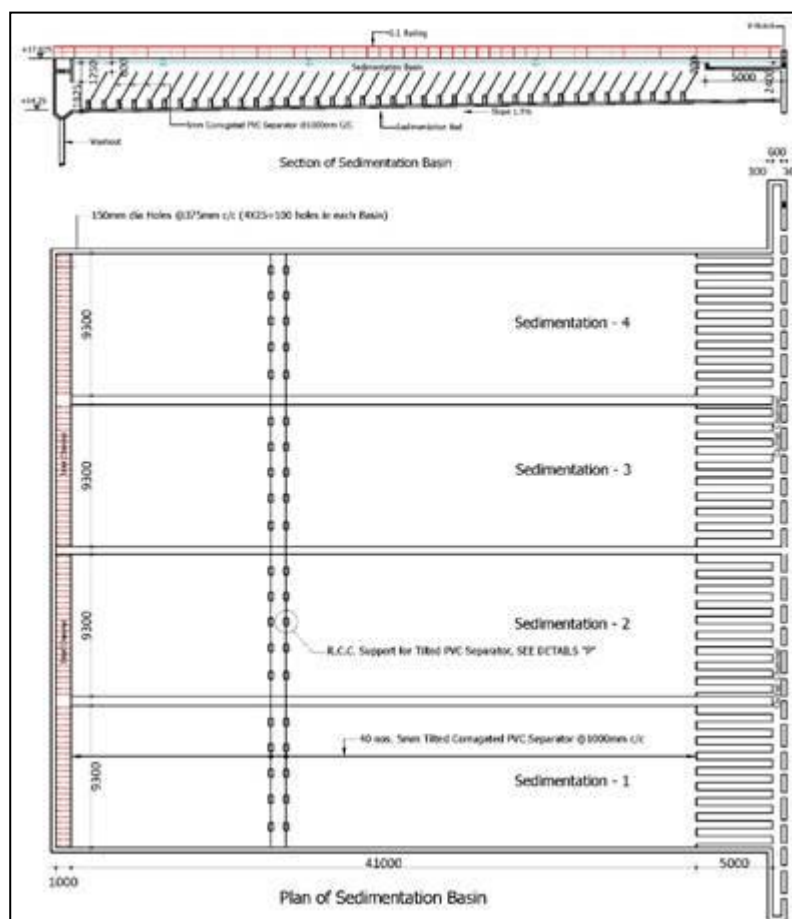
Plan and Sectional View of the Sedimentation Basin
